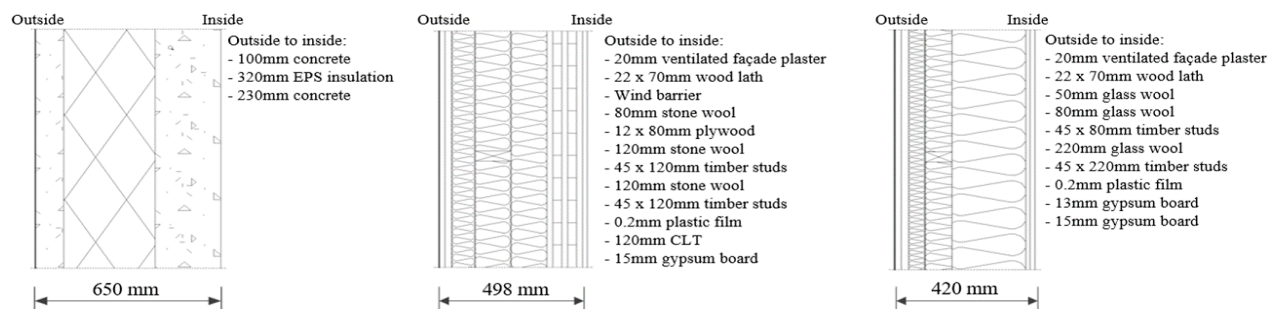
Outer wall details of buildings with the concrete (left), CLT (middle) and modular (right) construction frames to the passive criteria.
